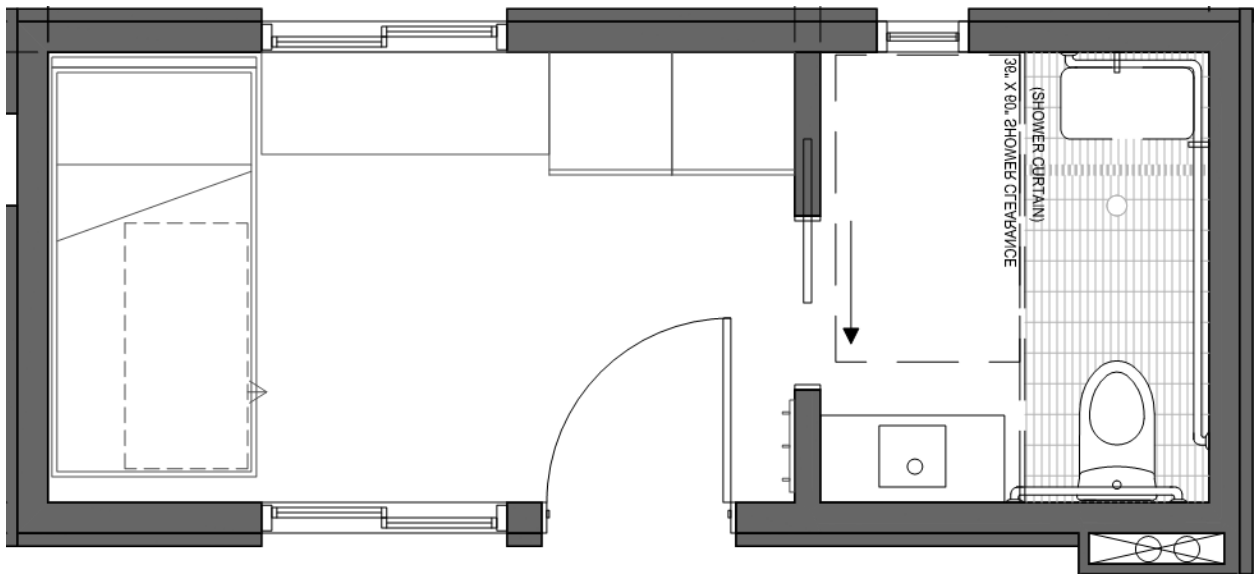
Unit plan showing a typical furnished ADA apartment on the garden level
